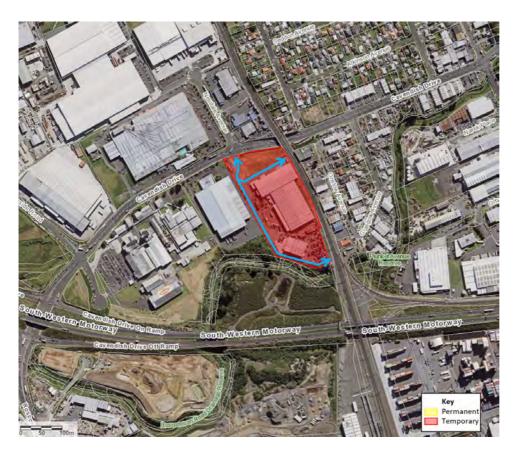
Proposed Access to the rail corridor off Cavendish Drive
